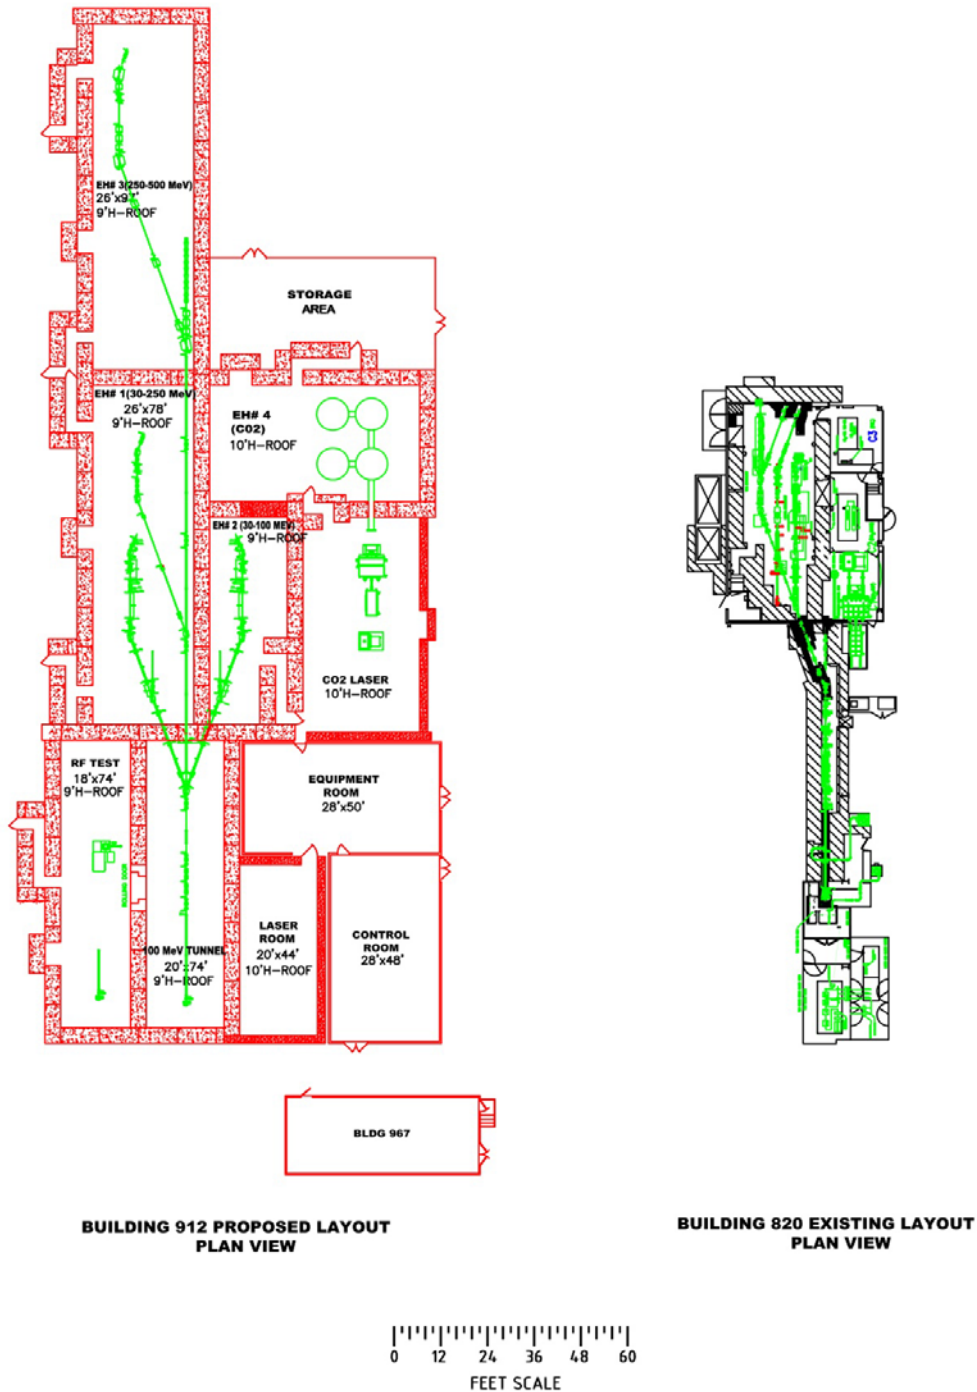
Proposed layout of the new ATF electron accelerator as designed for building 912.
